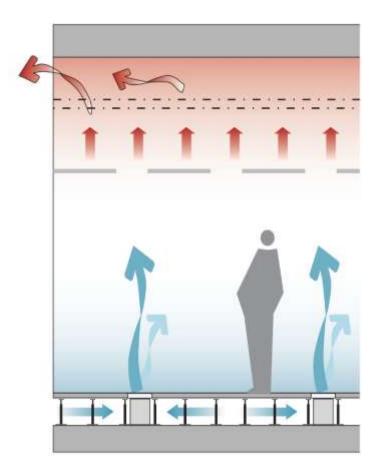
Elevated floor ventilation as presented by Cardin Julien + Ædifica
